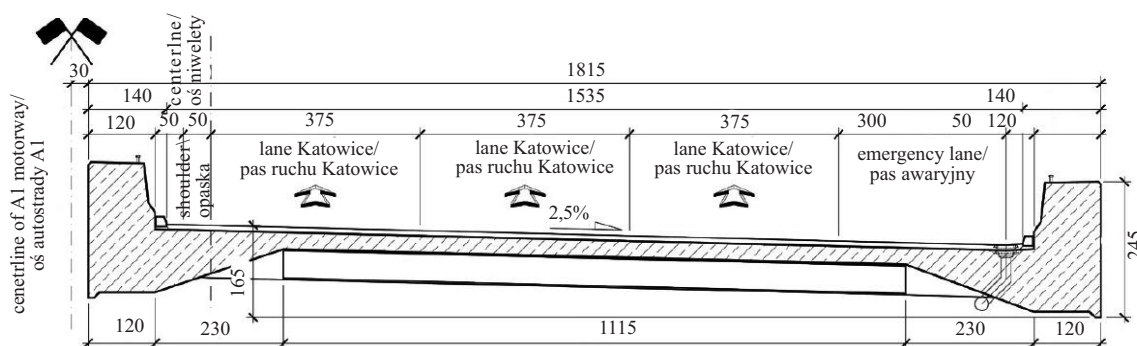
Dimensions of the span cross-section of the existing viaduct WA244P [6]
